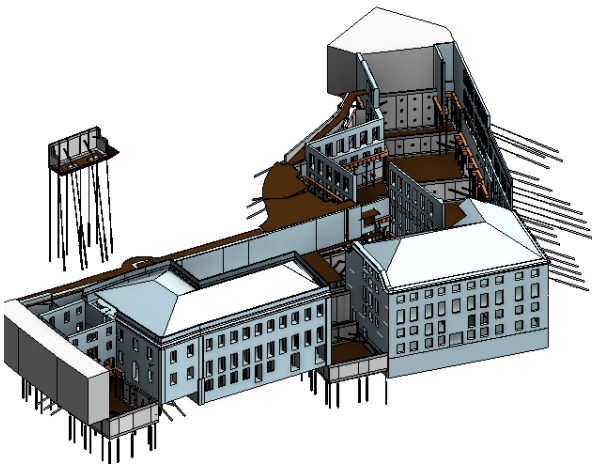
3D view of solutions for excavation and peripheral earth retaining.
